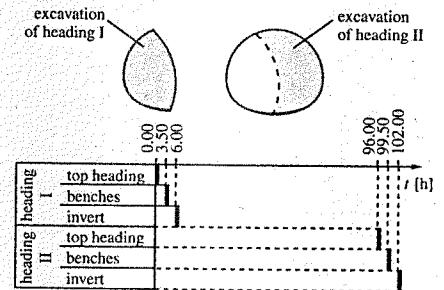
Time table for construction of NATM tunnel without jet-grouted support (staggered excavation scheme).
